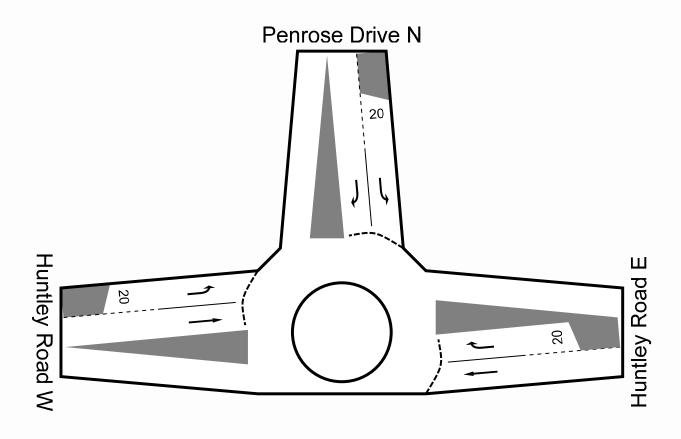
Huntley Road/Penrose Drive 2008 Intersection Layout
